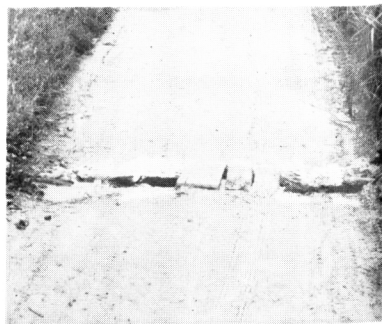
A crossing ditch used in this test and the white line (by lime)
